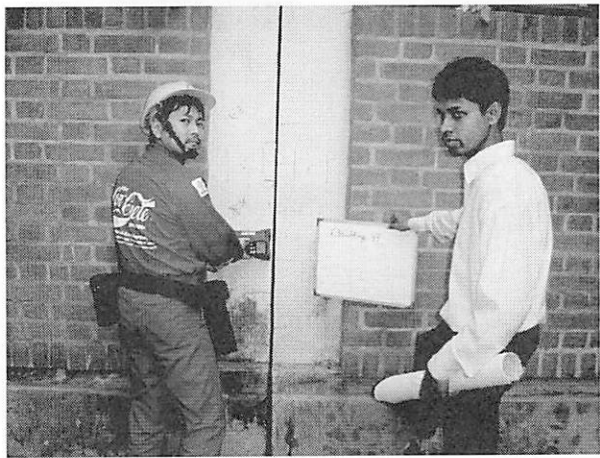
(a) Column reinforcement detection with Ferroskan at Building 47
